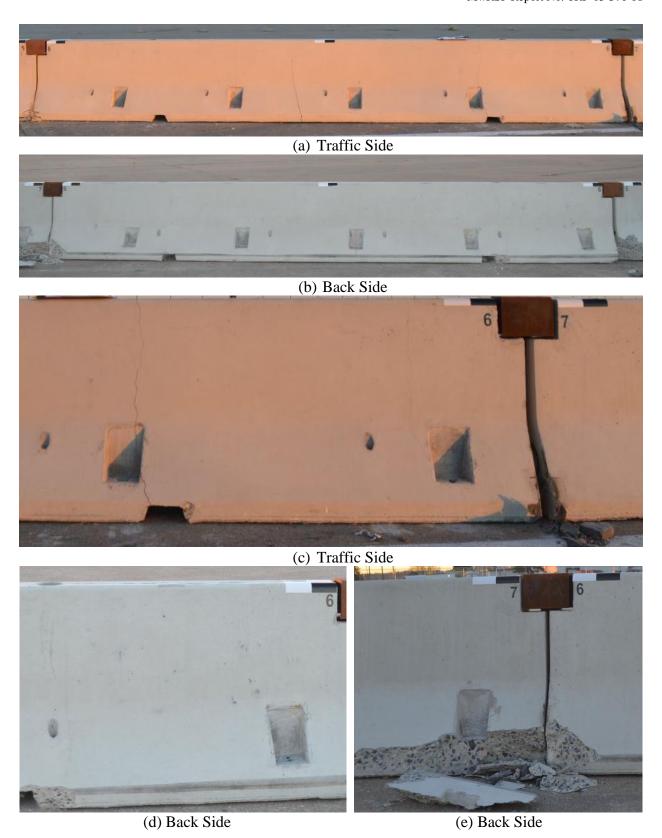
Barrier No. 6 - Traffic and Back Side Damage, Test No. NJPCB-4
